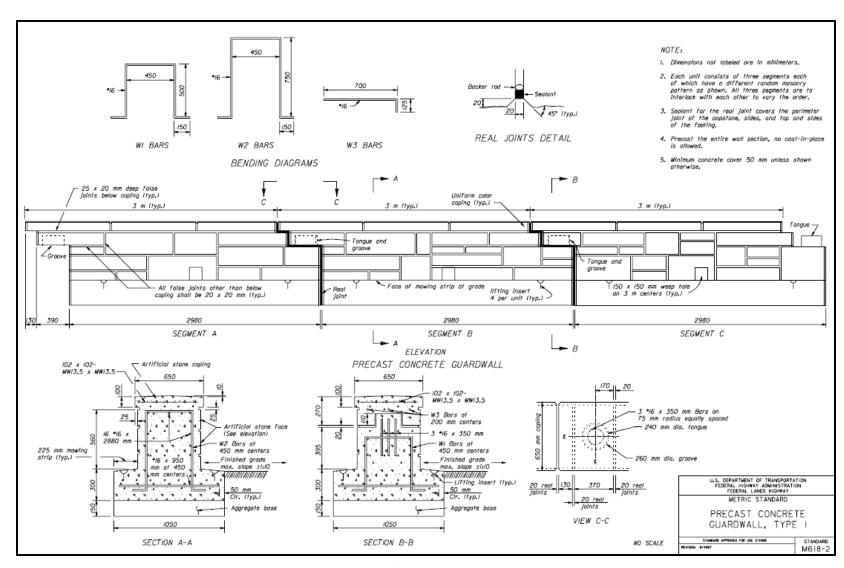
Layout and Cross Section of Pre-cast Concrete Guardwall
